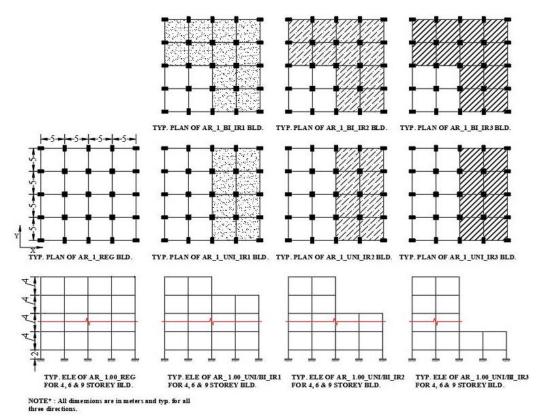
Typical plans and elevations of 4, 6, and 9-storey buildings
